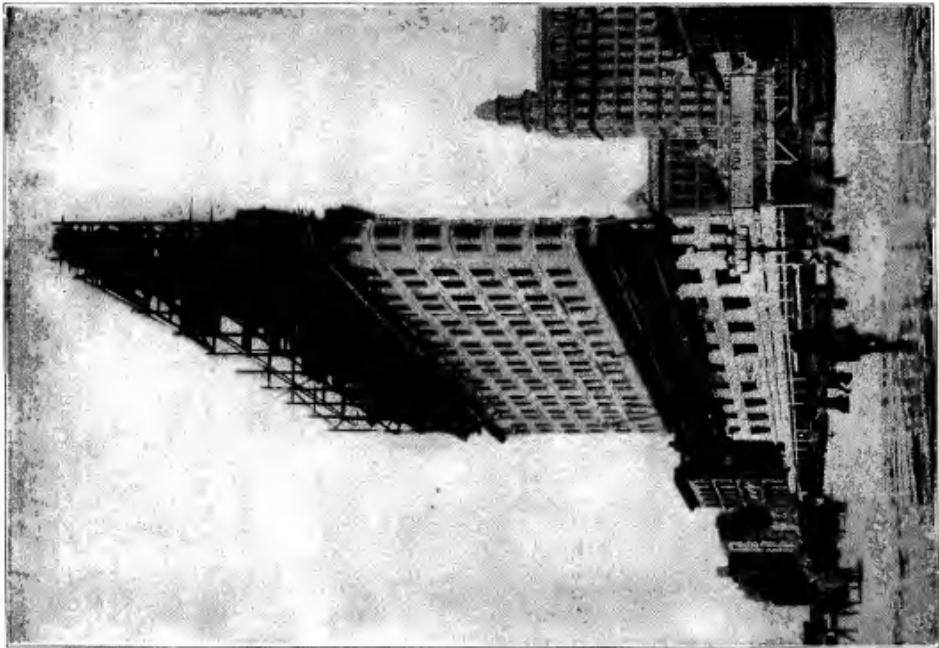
FLATIRON BUILDING, NEW YORK CITY.
